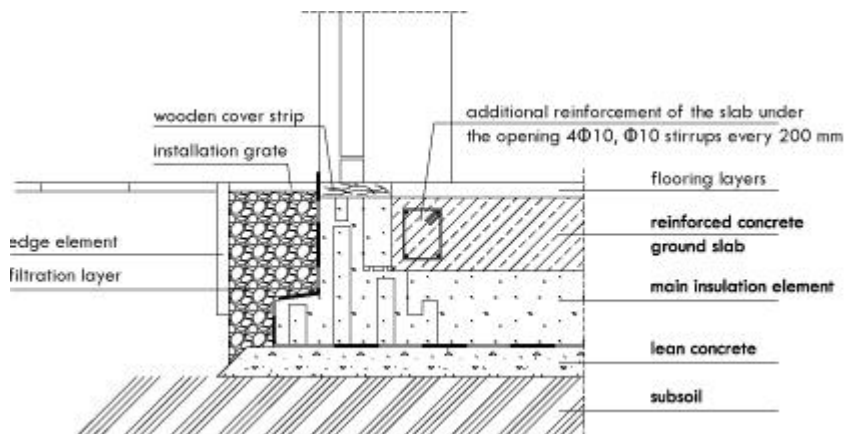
Additional reinforcement of the slab below an opening with a width larger than 1.0 m
